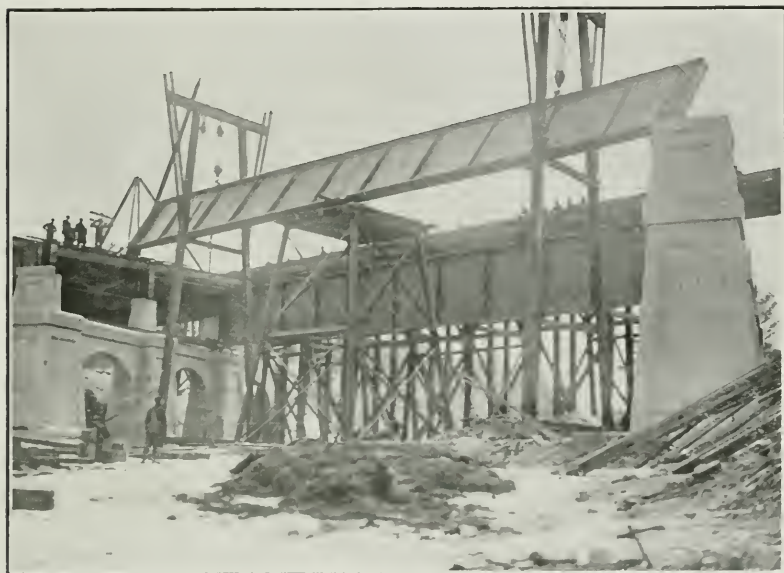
Erection of One of Inner 100 ft. Plate Girders.
